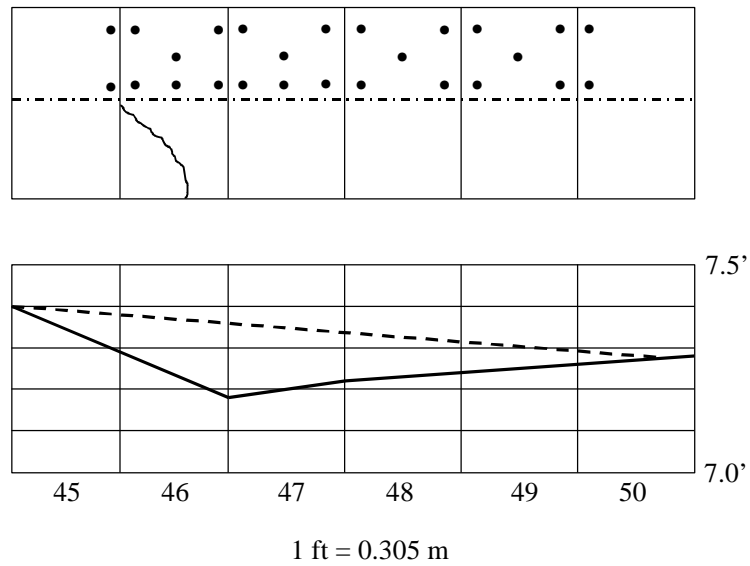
Plan and profile of a slab jacking segment in Louisiana.⁽²²⁾
